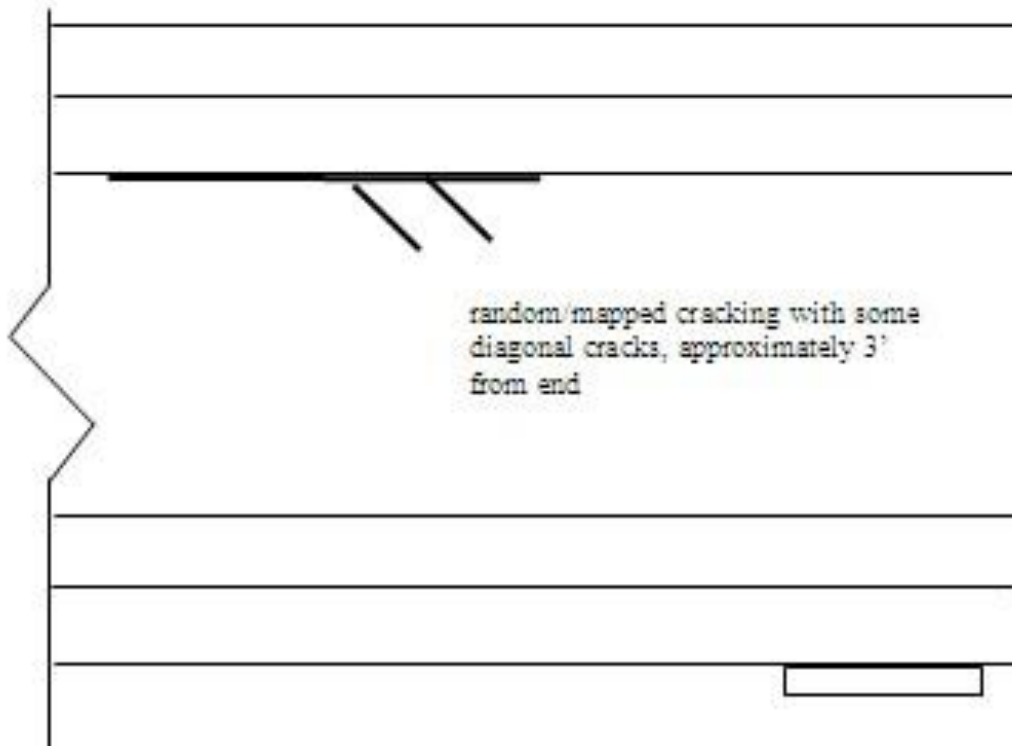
Crack diagram for south span girder, north end, 2nd beam from east side, east face (#7933).
